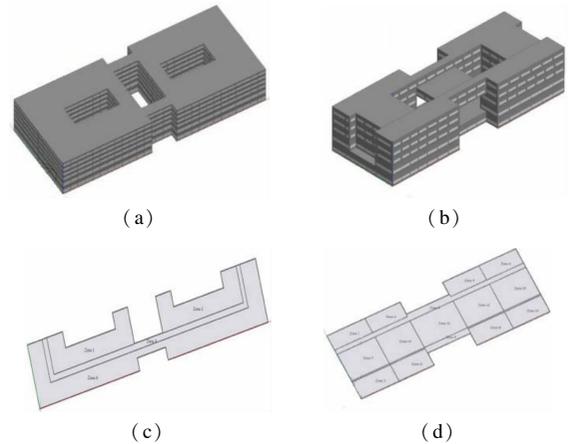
Overall appearances and floor plans of the two buildings. (a) Appearance of Building No. 1; (b) Appearance of Building No. 2; (c) Floor plan of Building No. 1; (d) Floor plan of Building No. 2
